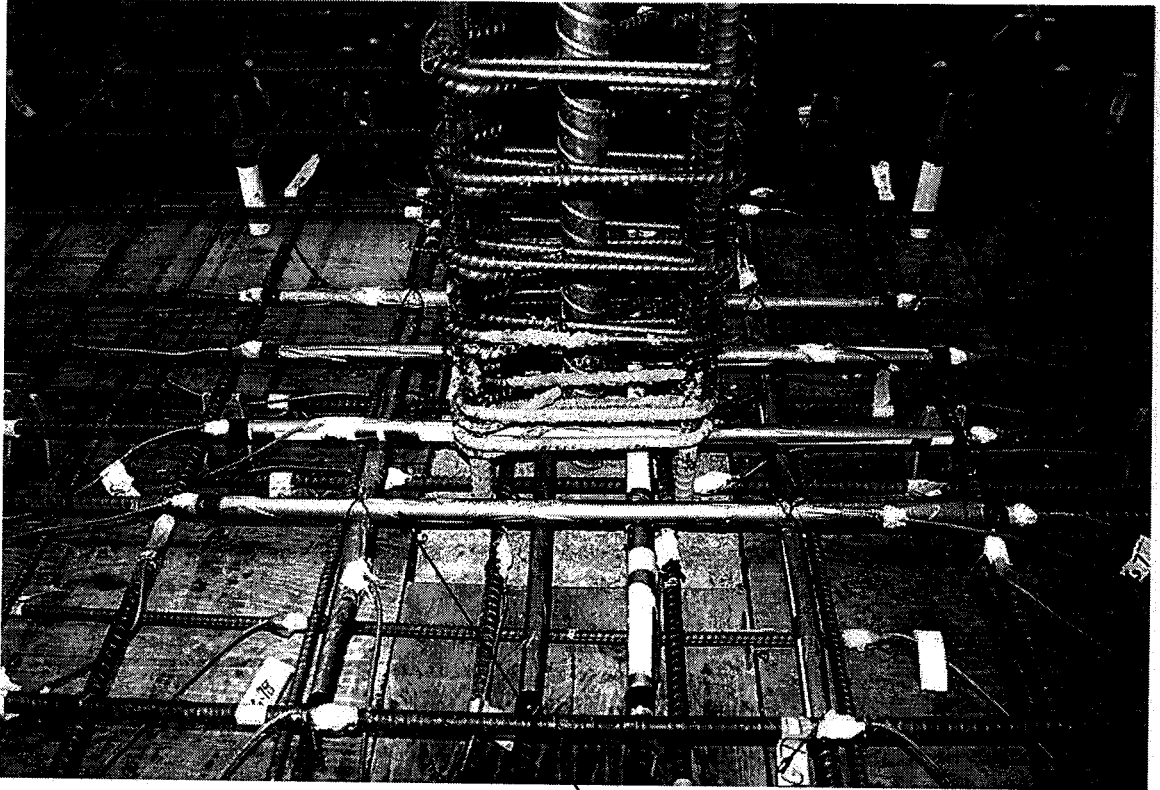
Slab-Column Connection with Partially Debonded Rebars
